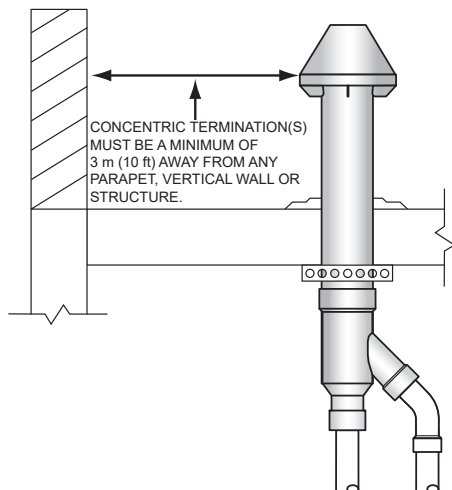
Flat Roof Concentric Termination - Roof Parapet Clearances
